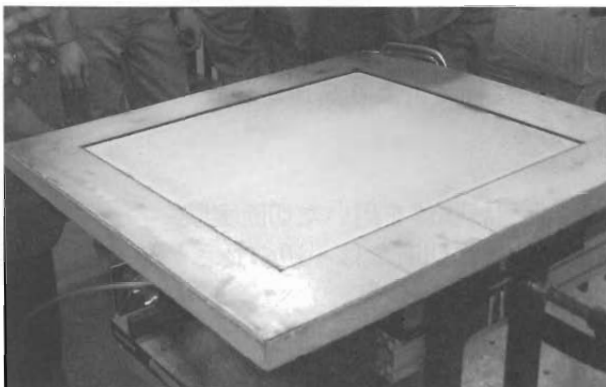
Liner Stripped from Concrete after Cutting in the Flat Position
